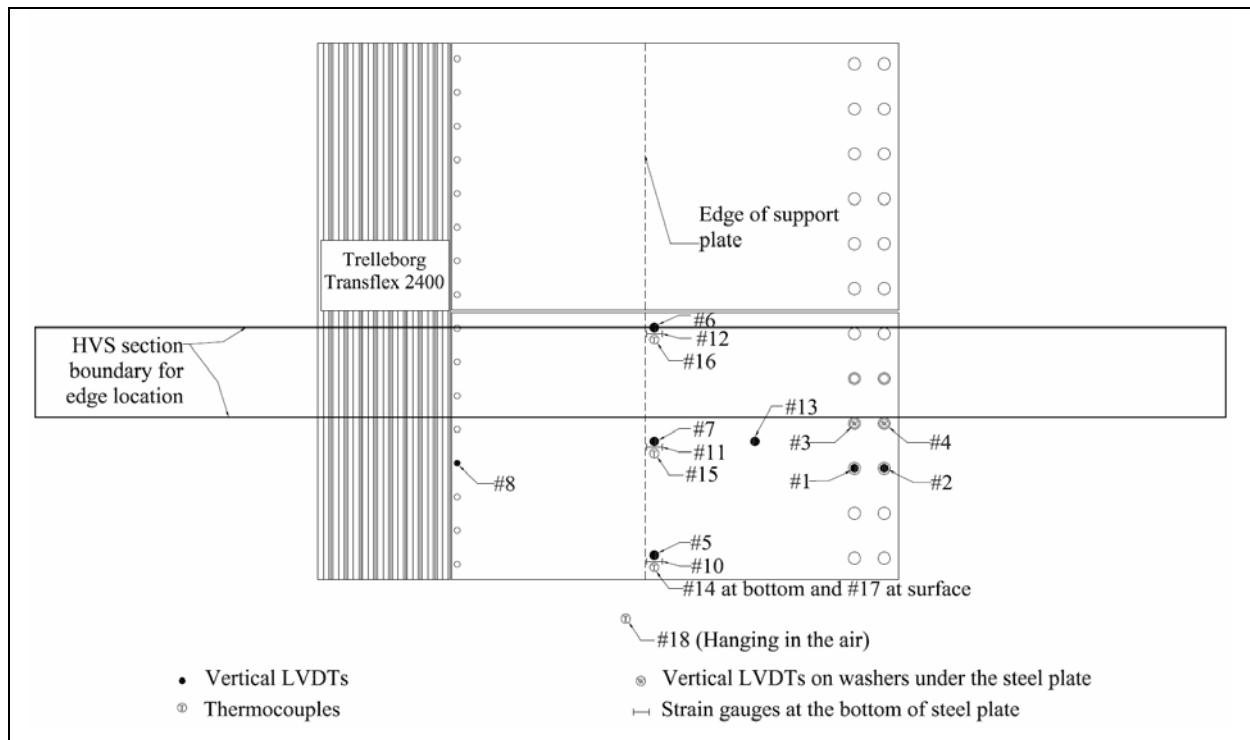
Layout of instrumentation for testing on the edge of the expansion joint.
